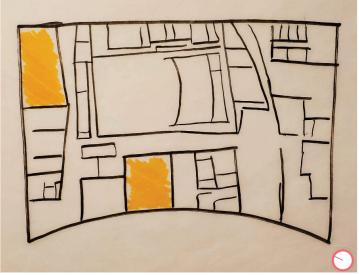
AUTHOR'S SKETCH OF FIRST FLOOR PLAN
